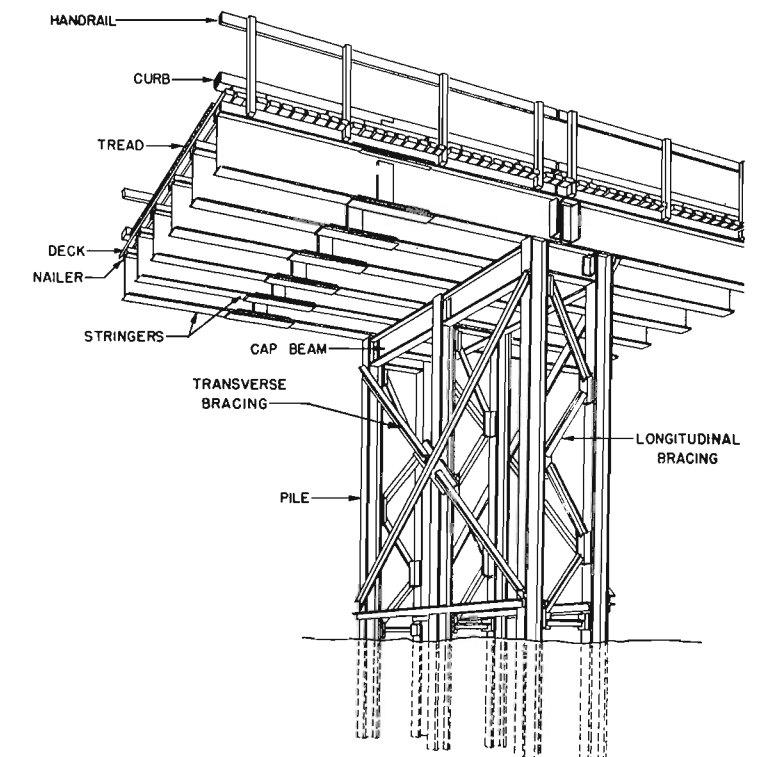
Highway bridge, class 25 or class 50, double-lane, steel stringers on steel pile pier.
